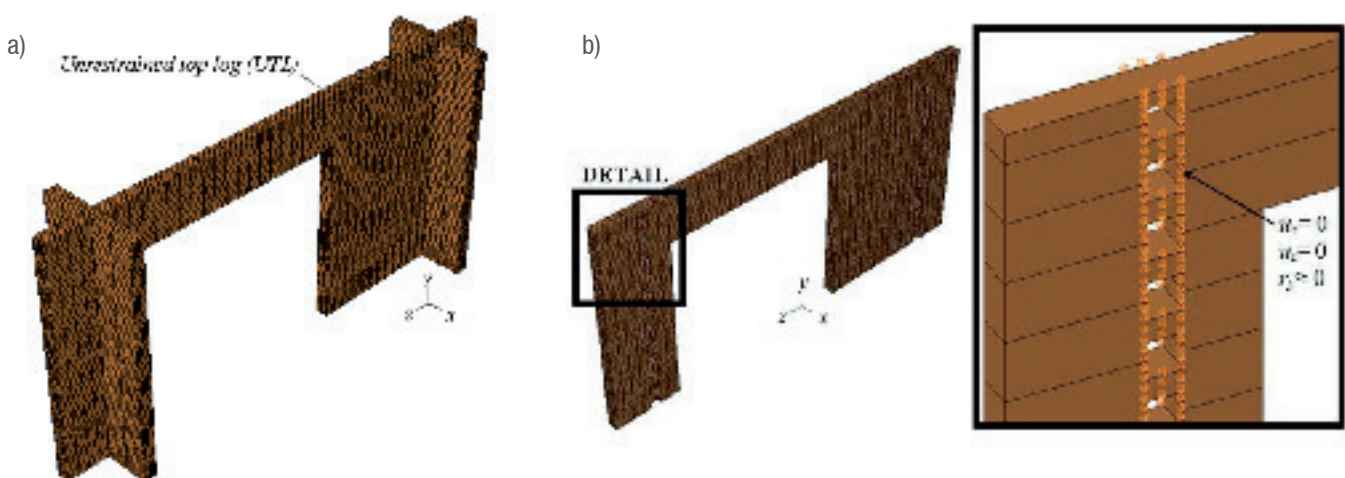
Example of the typical FE-numerical model of a timber log wall with single door opening (ABAQUS/Standard)
